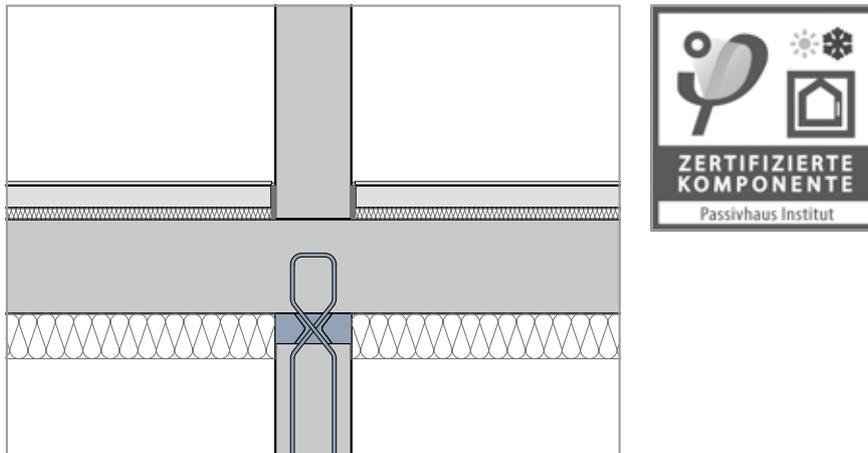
Schöck Sconnex® type W with internal wall and under-slab insulation
